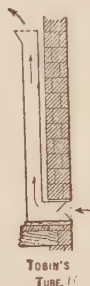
Vertical section showing the wall, grating, and flanges to direct the air over a tray of water on the floor and Tobin's tube running upwards about 6 feet.
